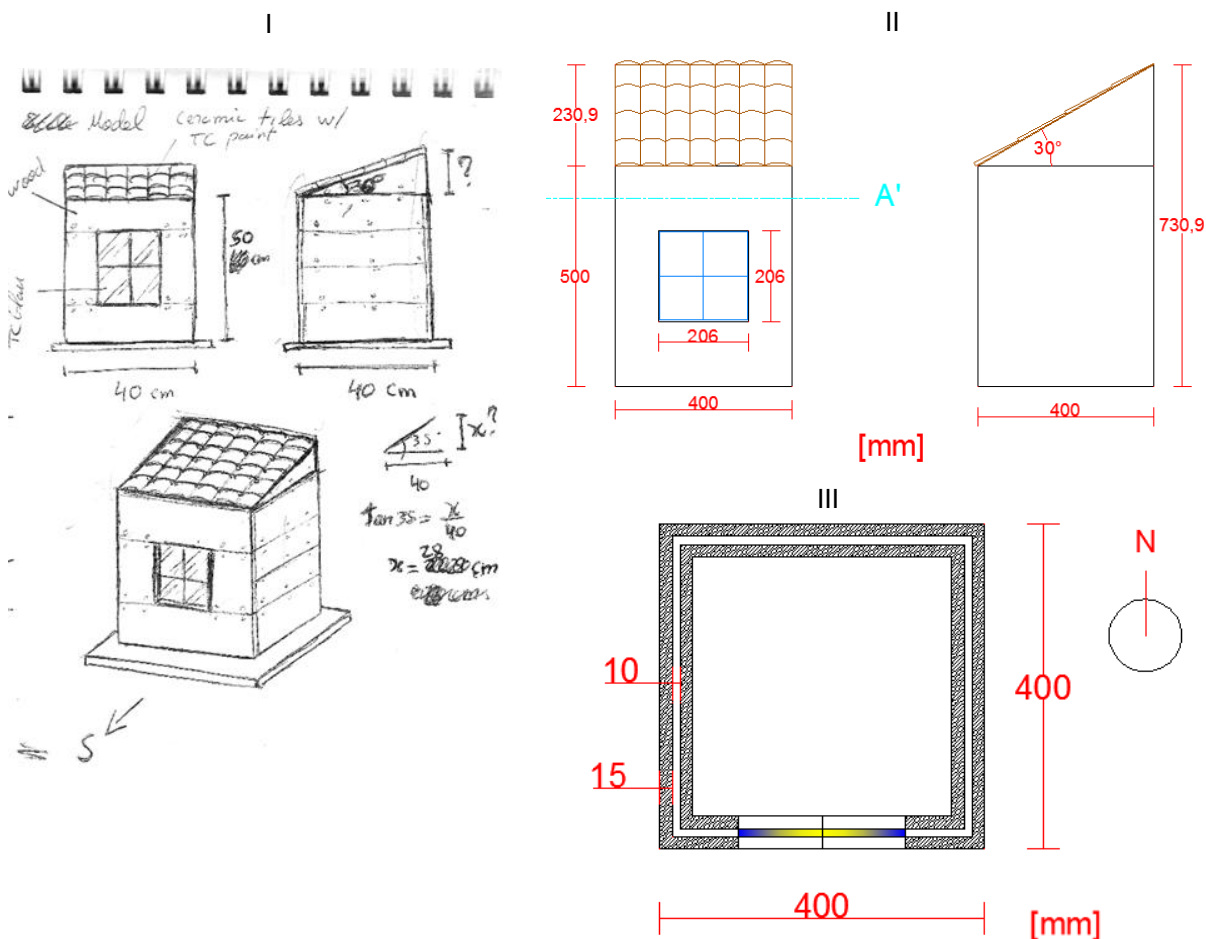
First house model draft (I); North and east facades (II); Model plan (III).
